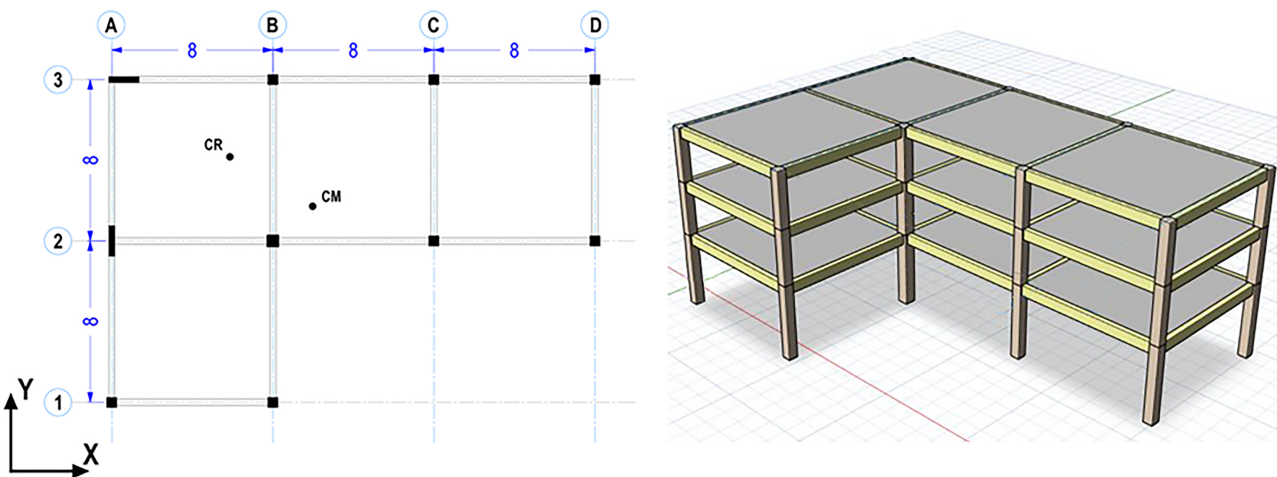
Plan view and isometric view of the three-story concrete frame (units in m) [Colour figure can be viewed at wileyonlinelibrary.com]
